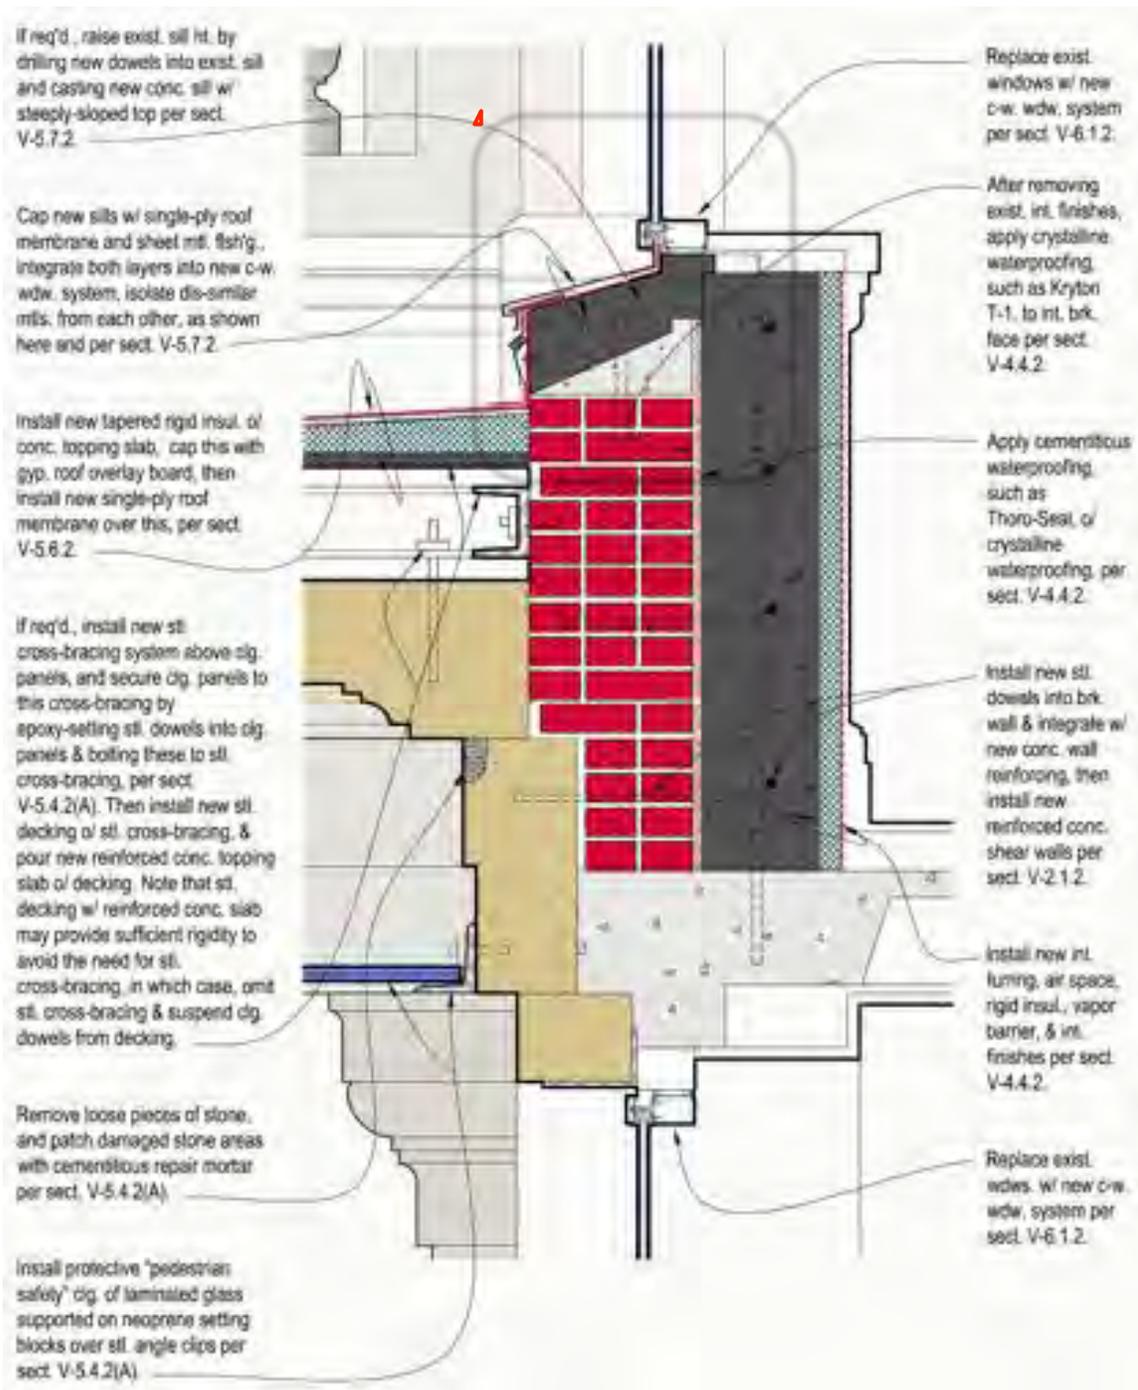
(4): Window Sill Installation Above Portico Roof
